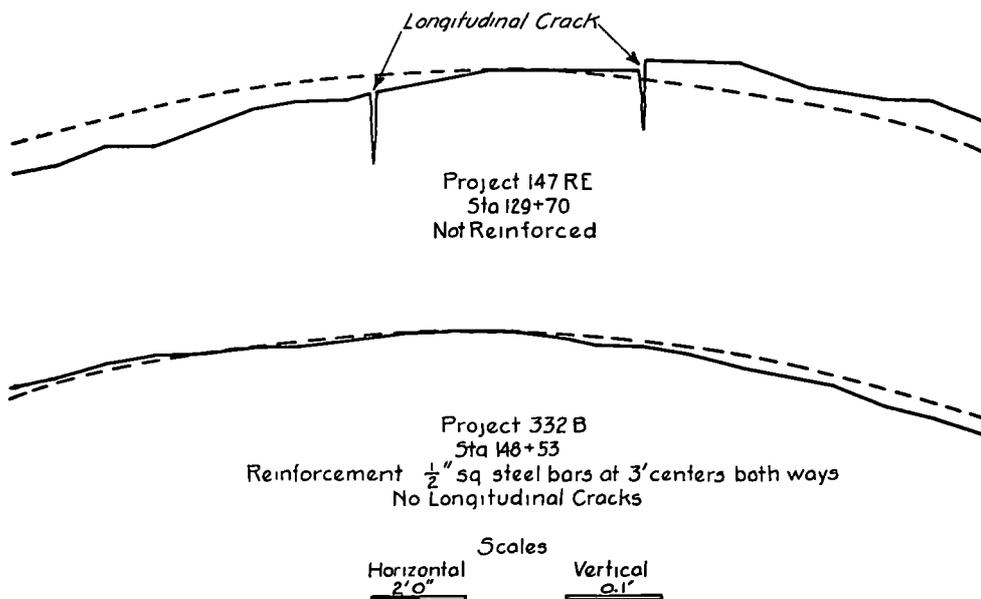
Pavement Cross-sections. The dotted lines show the theoretical cross-sections of the pavements when constructed. The solid lines show the cross-sections in 1935.
